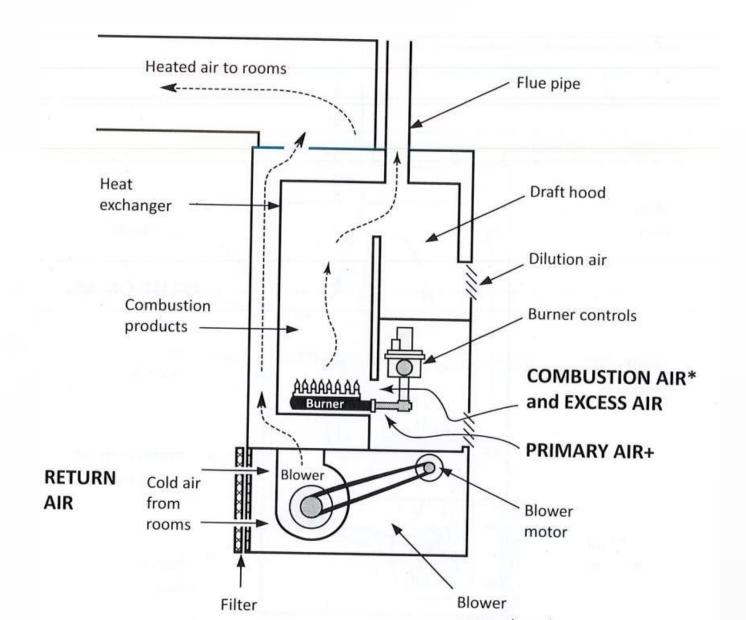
Cutaway of a furnace showing combustion and excess air
